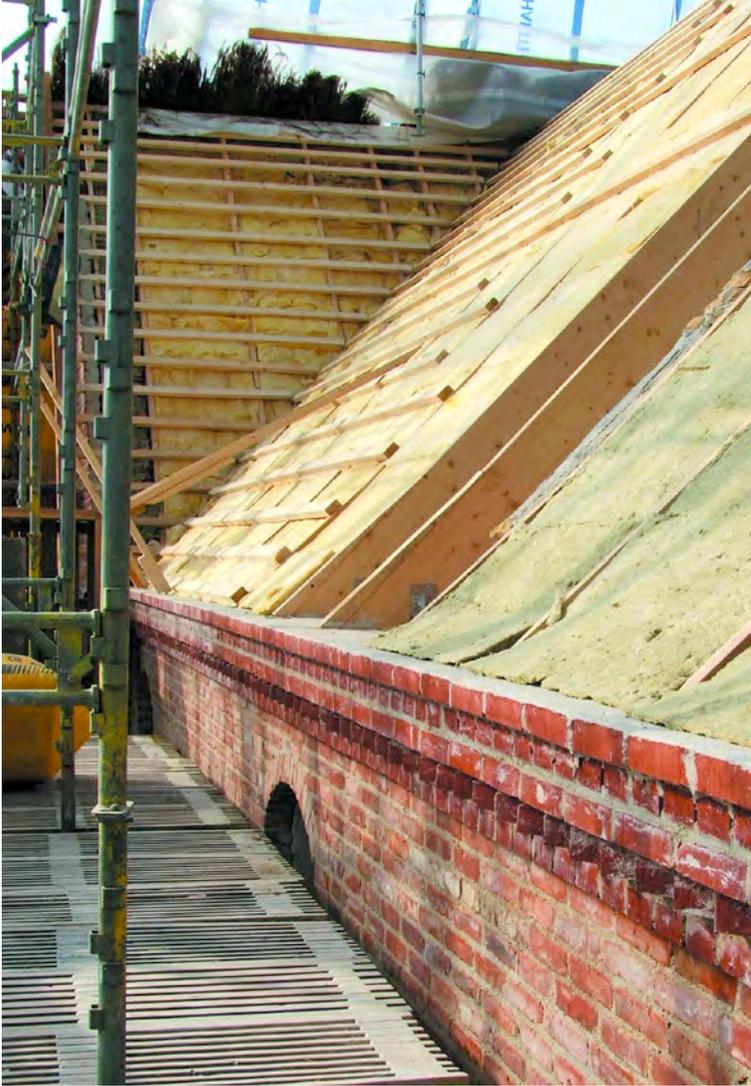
Mineral wool thoroughly insulates cavities in roof and walls against air and fire movement. Treated fiberglass blanket will cover roof battens before application of thatch. All masonry is lime-mortared.
